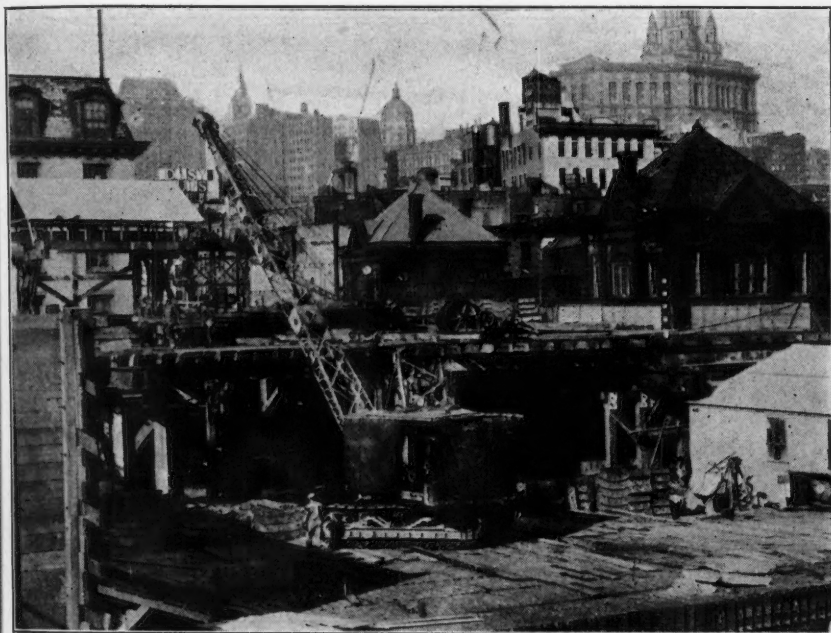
STORAGE YARD AT BULKHEAD IN MANHATTAN.
